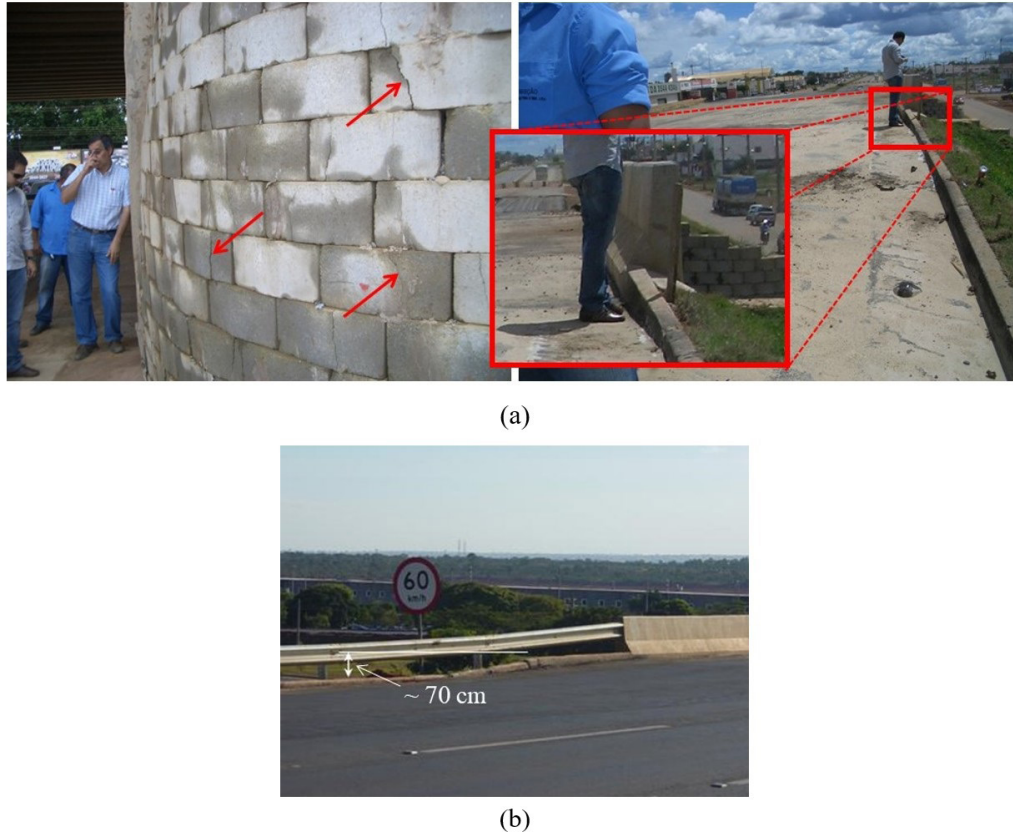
Damages to retaining walls due to structural collapse of the foundation soil: (a) geosynthetic reinforced wall; (b) conventional concrete gravity wall.
